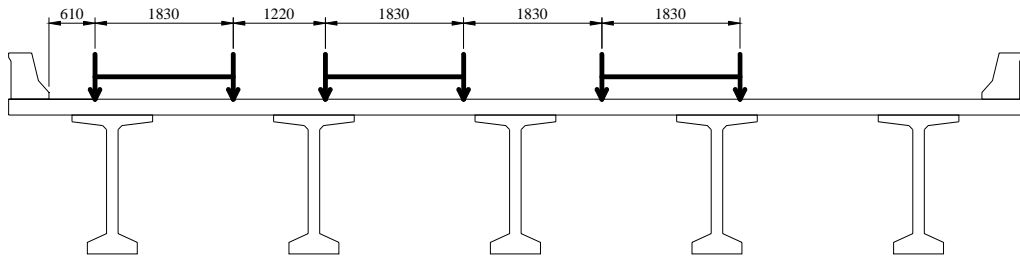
Varied Vehicle Spacing (Precast Bulb-Tee Beam)
